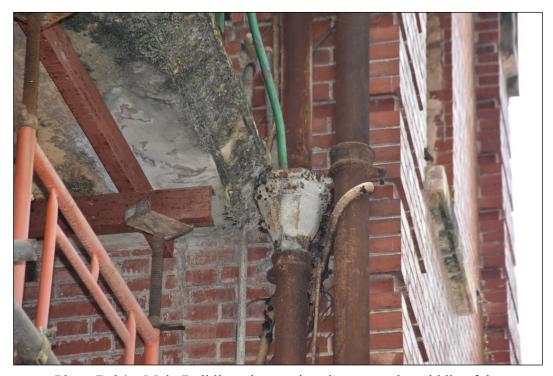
Main Building, the cast iron hopper at the middle of the rainwater downpipe, (collect rainwater from first floor balcony),
